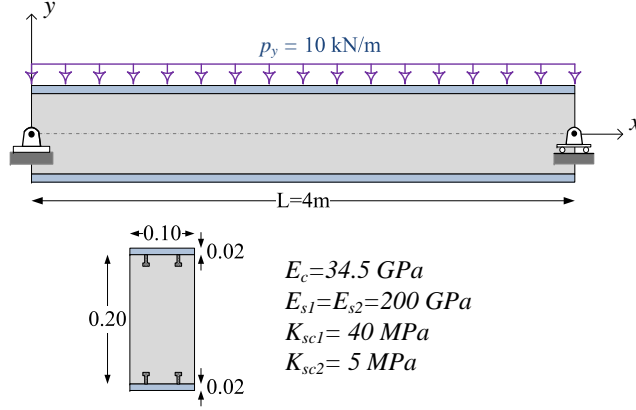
Sandwich beam with transversal loads (dimension in [m]).
